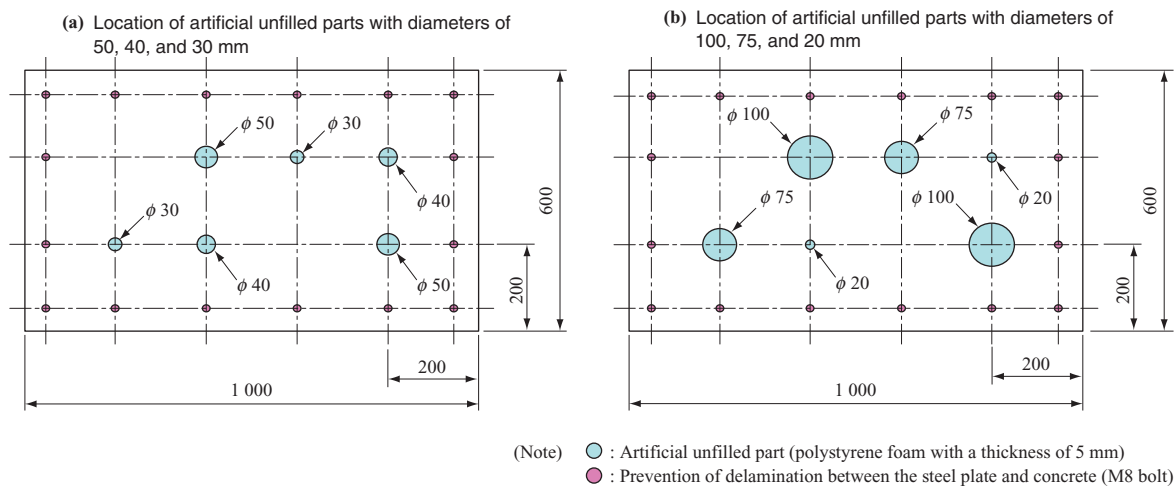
Configuration of artificial unfilled parts in specimens (unit:mm)
